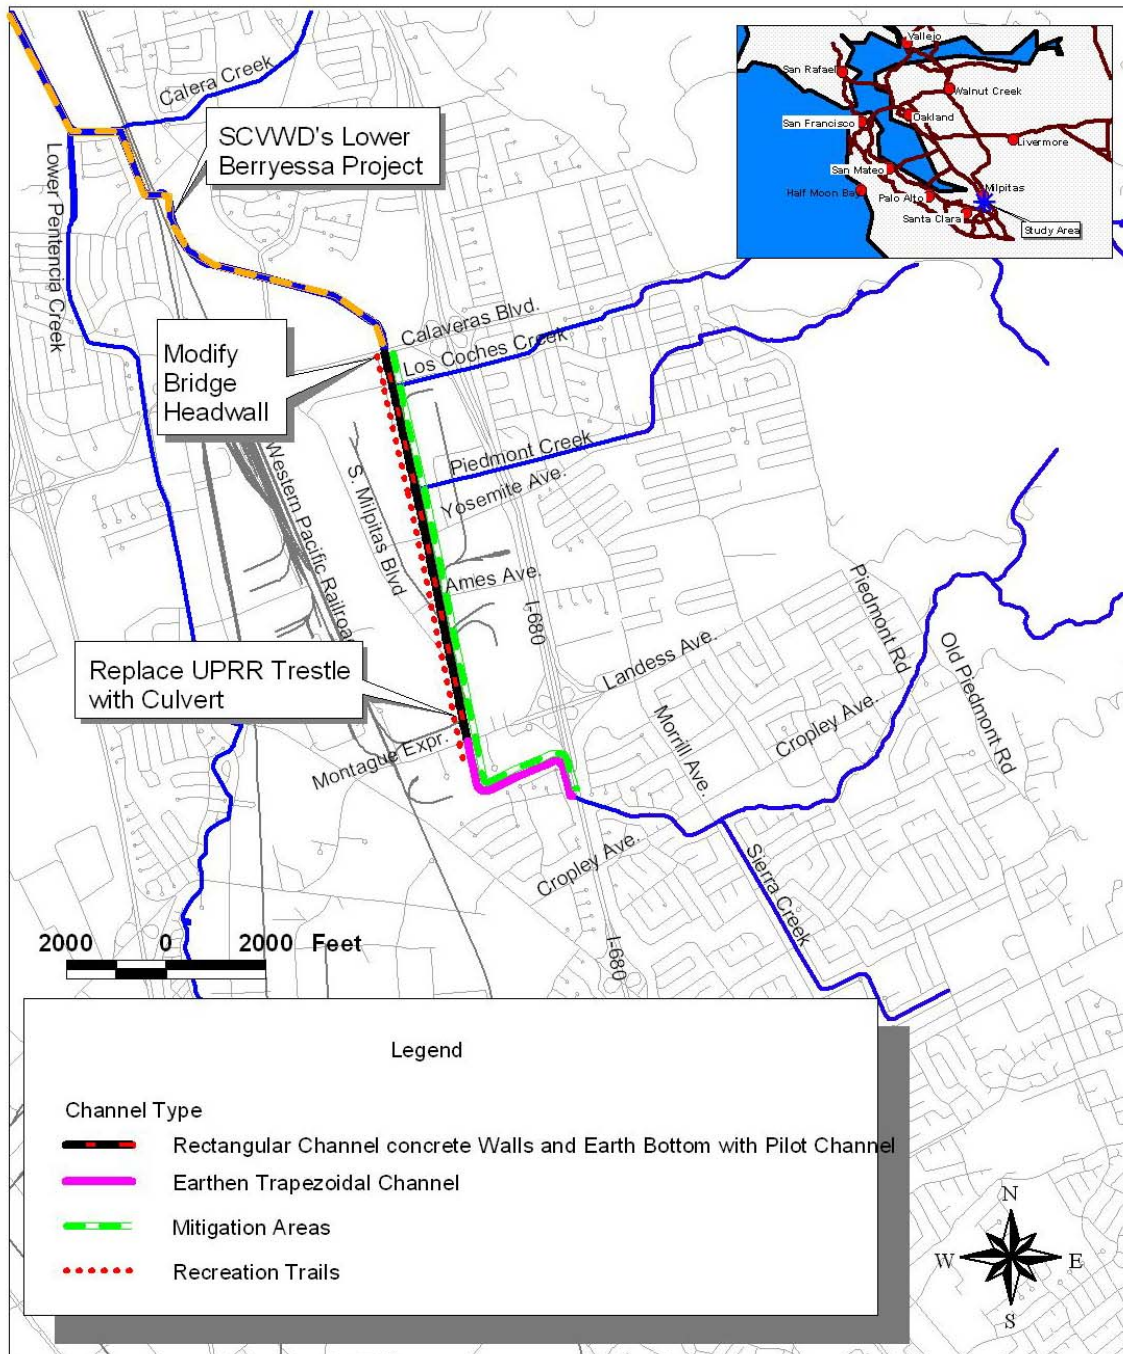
Alternative 4 – Earthen and Walled Terraced Channel (Highway 680 to Calaveras Boulevard)
